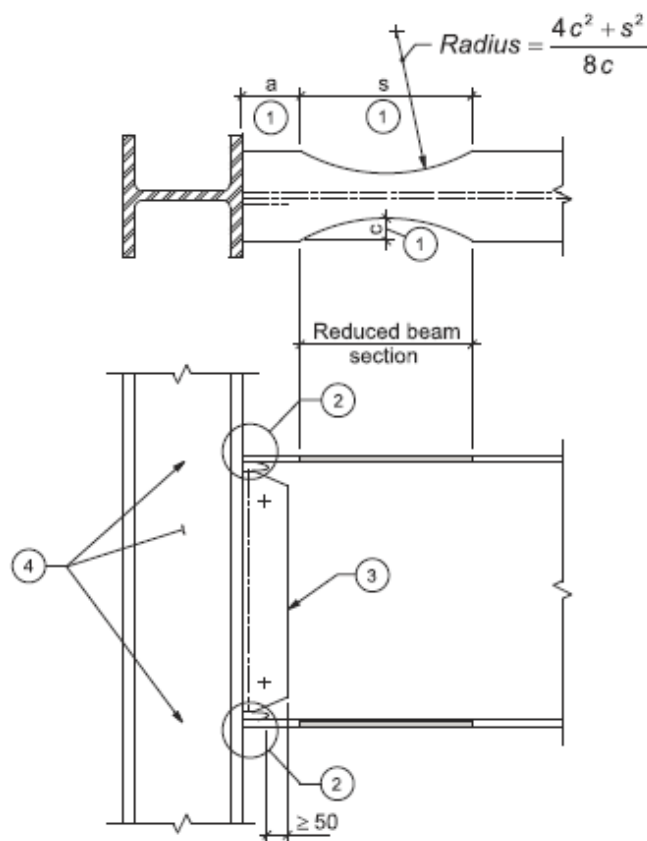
Reduced Beam Section (RBS) Connection (CISC 2008).
